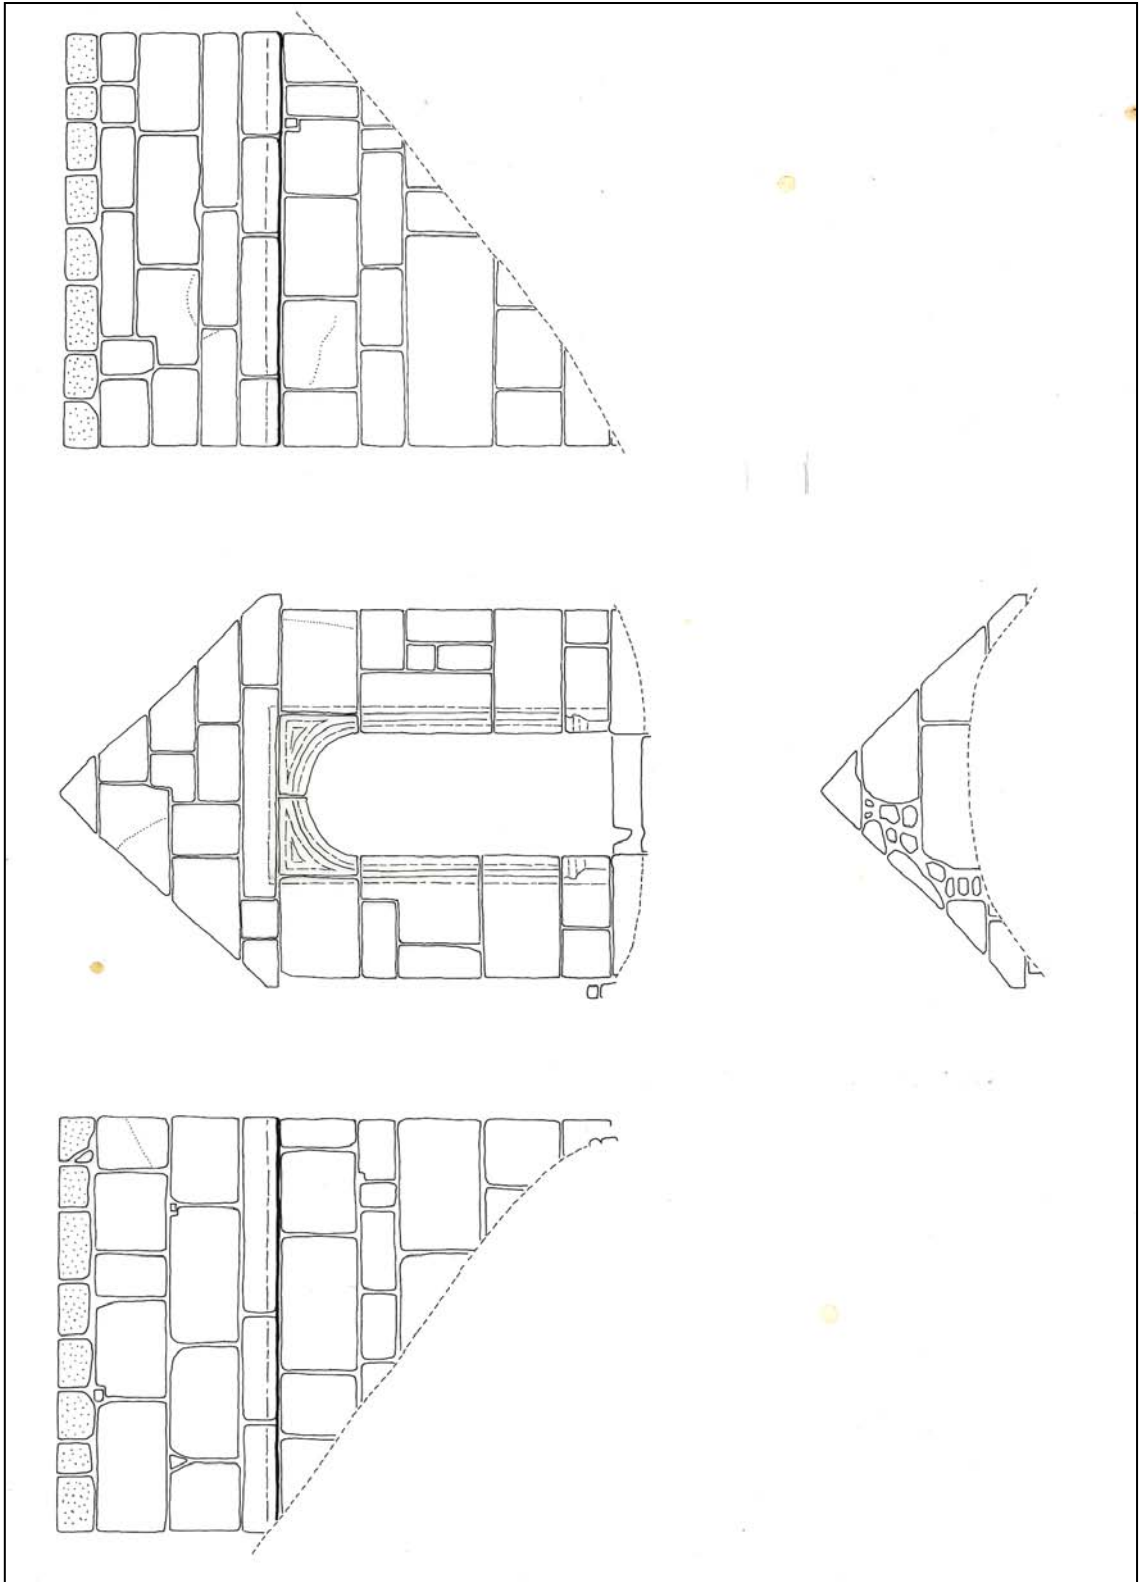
Towan Well: external elevations (for scale, see measurements in text)
